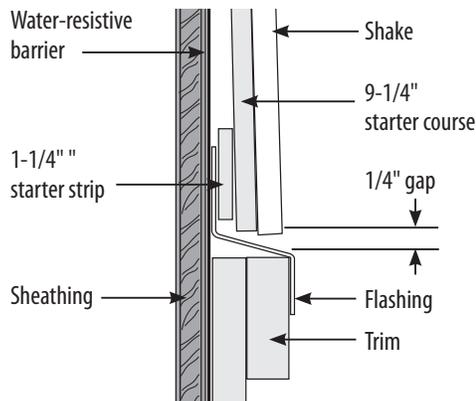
STARTER STRIP AND "Z" FLASHING DETAIL
